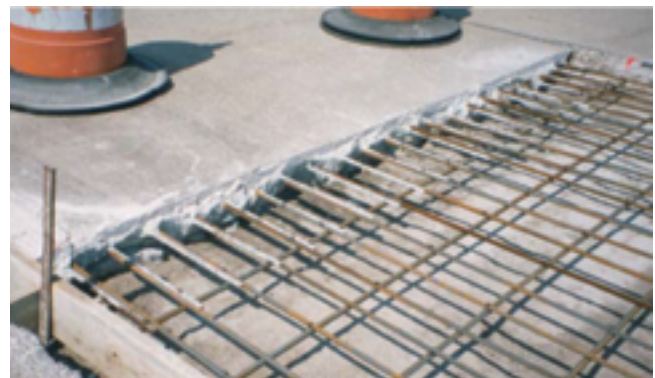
CRCP repair with longitudinal and transverse steel.
